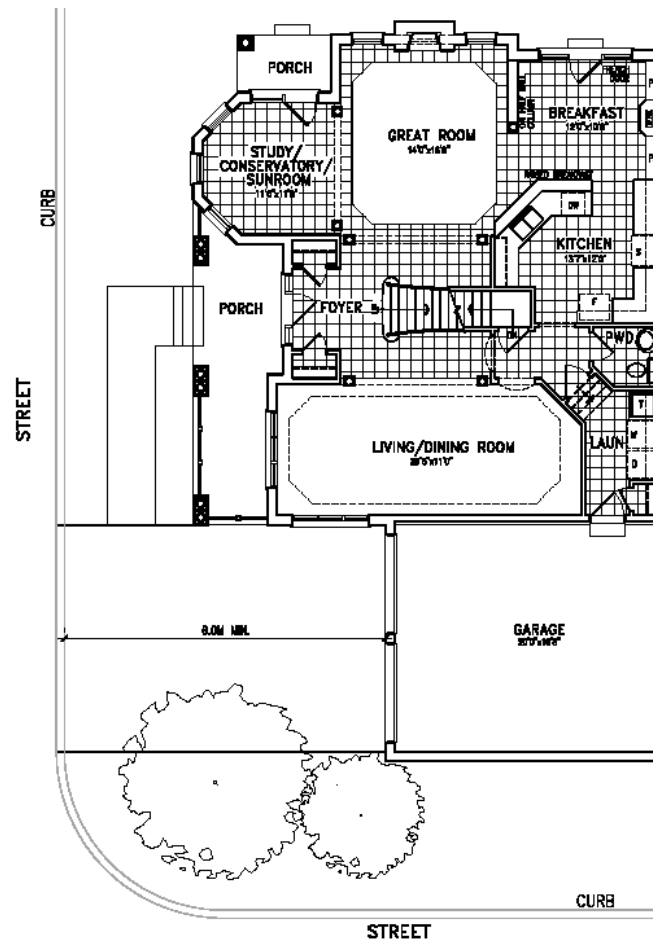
Illustrates a possible Corner Lot Plan Concept
